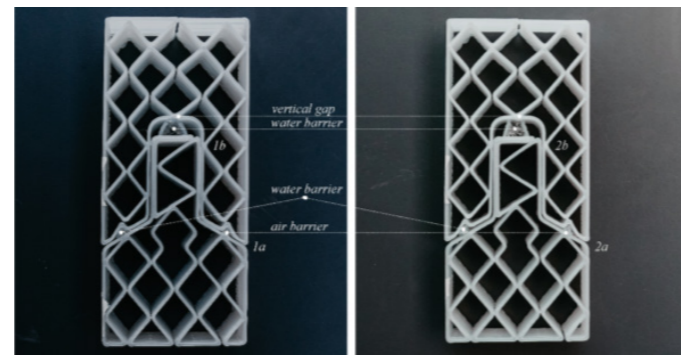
Façade panel connections, hybrid connection study for the horizontal direction (Cheibas et al., 2022)
